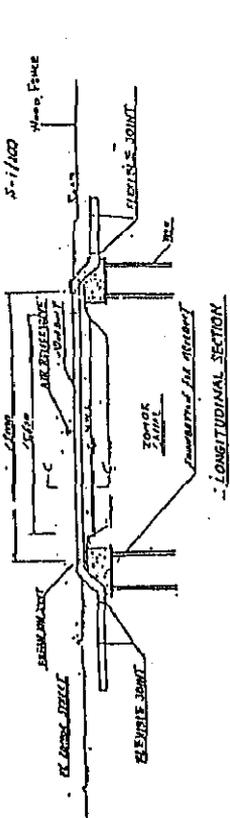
TYPICAL SECTION OF JOINT OVER THE
